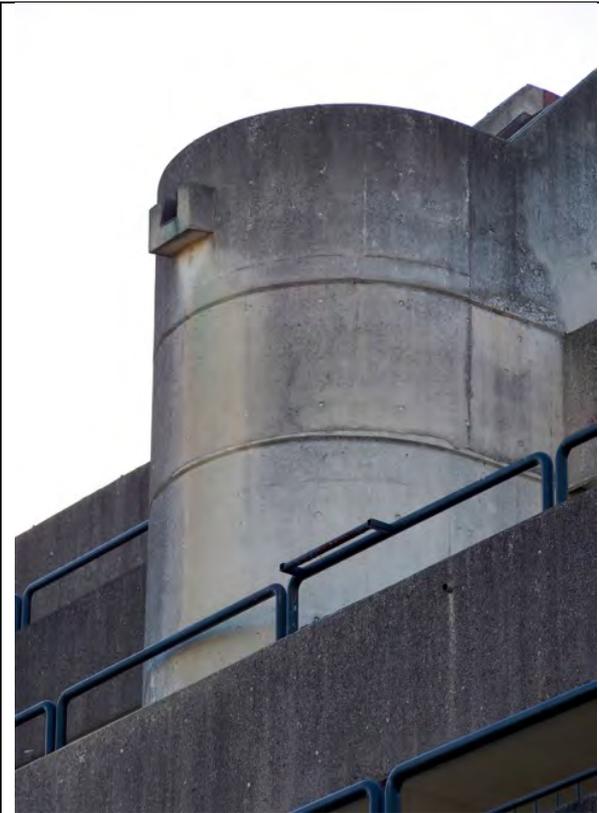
Detail of SE elevation, facing Ferry Lane.
